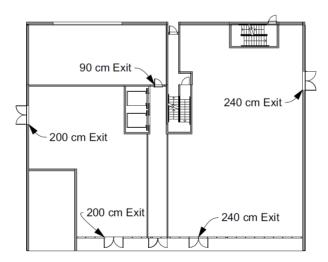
Floor plan of ground floor. Exit widths are shown.
